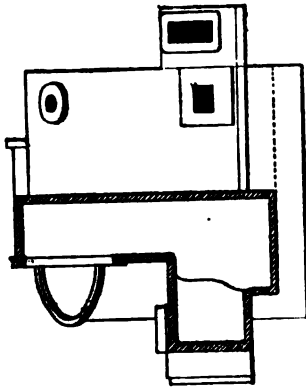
, the plan and elevations of the starting platform; Fig. 5360, the hand-rails and stanchions; Fig. 5361, the hand-rail support brackets.
